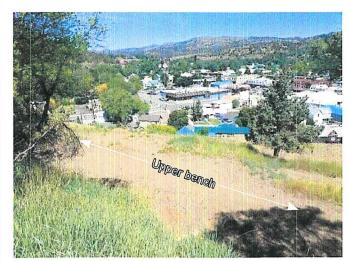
Looking east at cut slope present at south side of lower bench of site.
